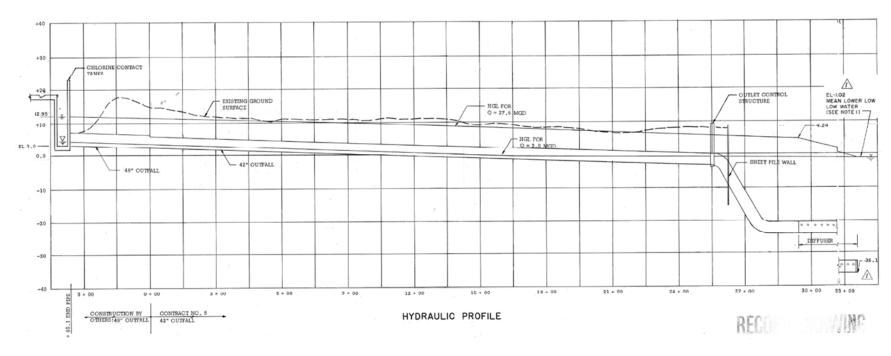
Outfall Hydraulic Profile (1979 Outfall CONTRACT NO. 8)
